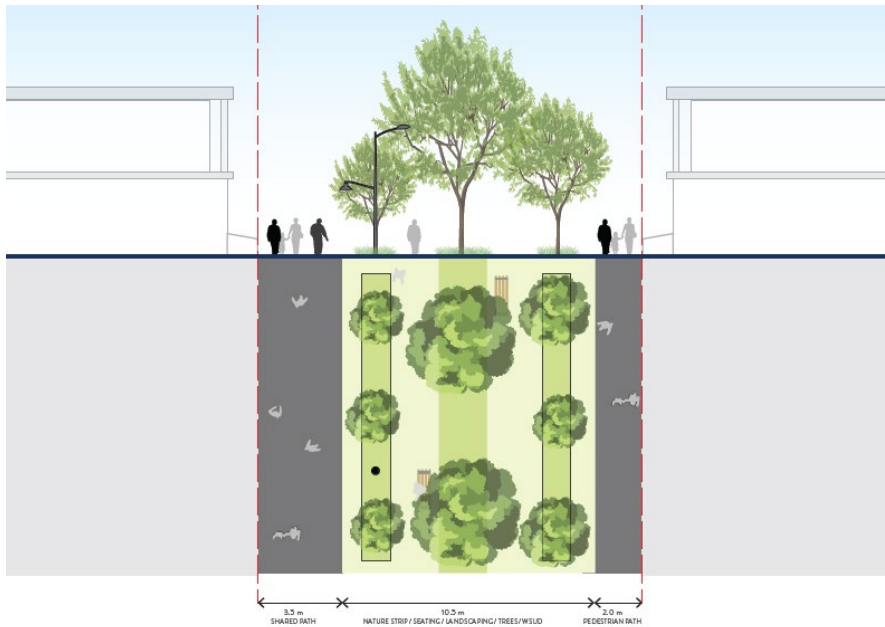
Cross section of the Narrow Pedestrian Street (10m)
